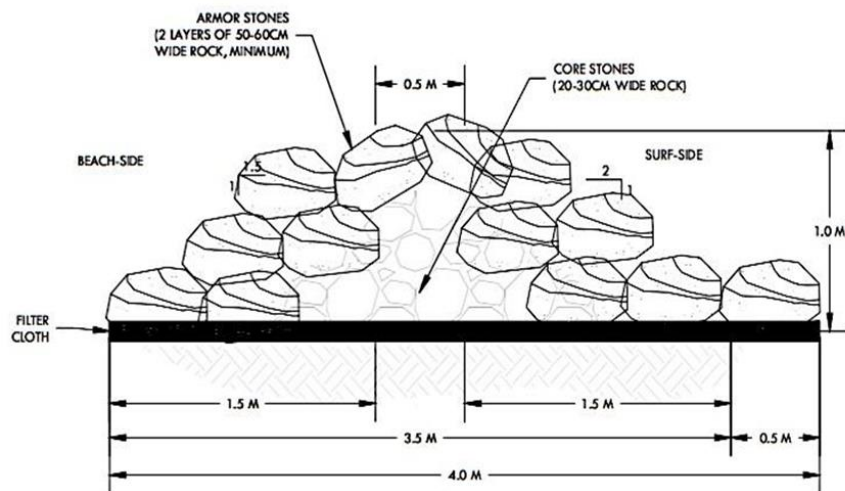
Detailed design of the permeable living breakwater in Bacjawan Norte
